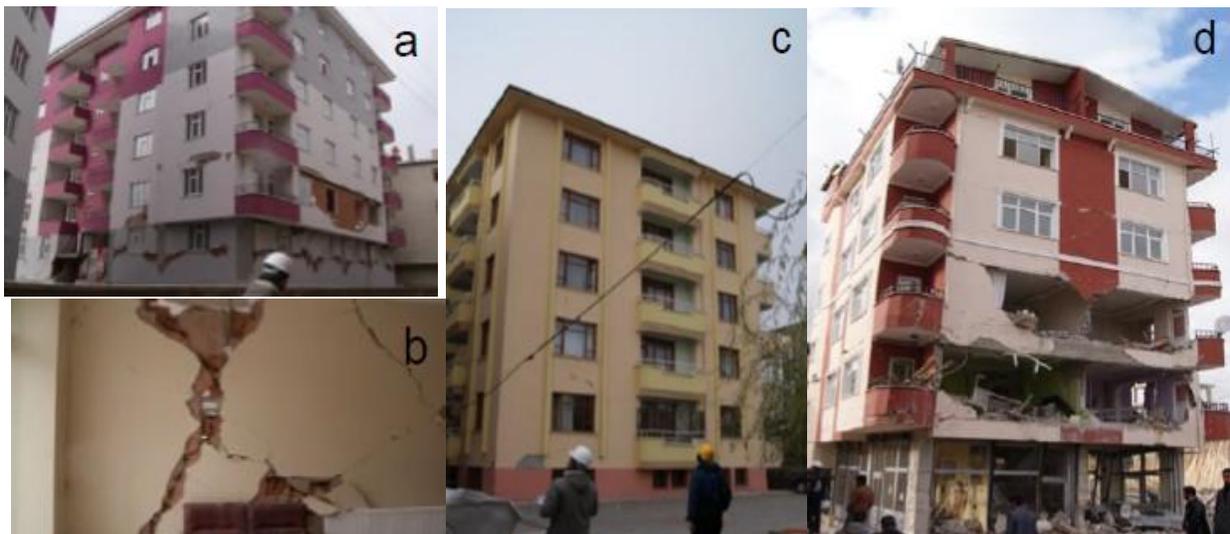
Damage to infills in 2011 Van Earthquake: a) in-plane damage, b) damage inside building in a, c) moderate damage, d) heavy combined damage
